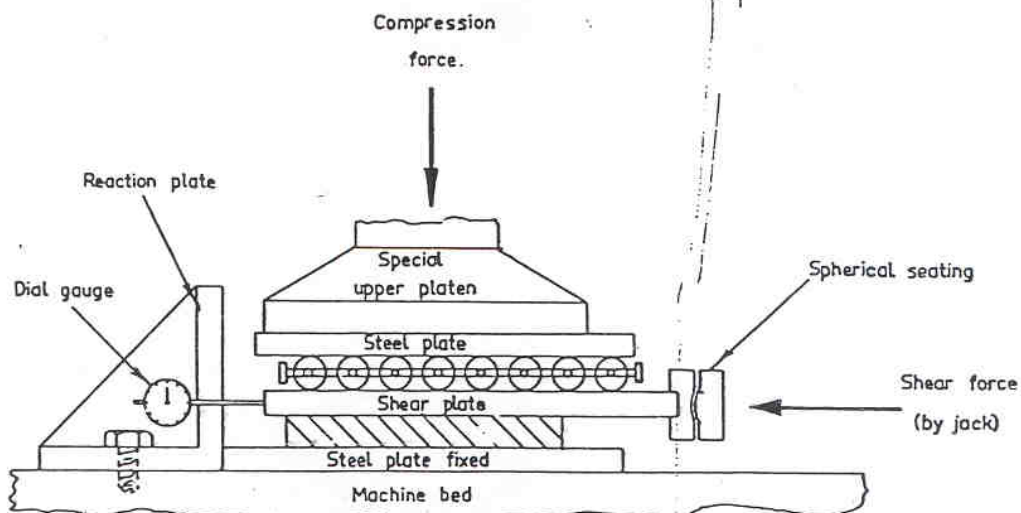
Arrangement of plates, bearings and rollers when only one bearing is being tested.
